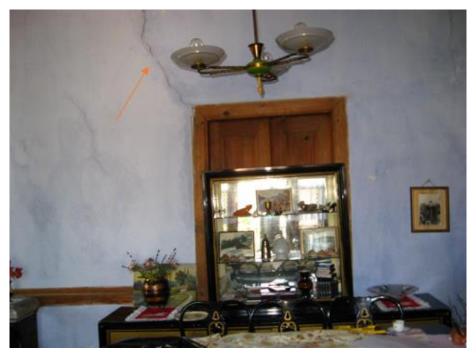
Ayşe Sezgin House of crack caused by mechanical action on the wall surface.
